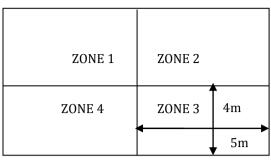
PLAN VIEW OF A SAMPLE BUILDING
